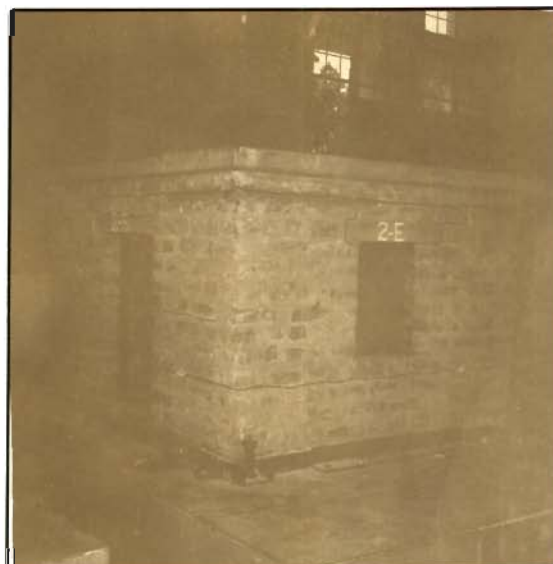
SOUTH AND EAST WALLS OF MODEL NO. 2 DAMAGED WITH FIXED BASE
